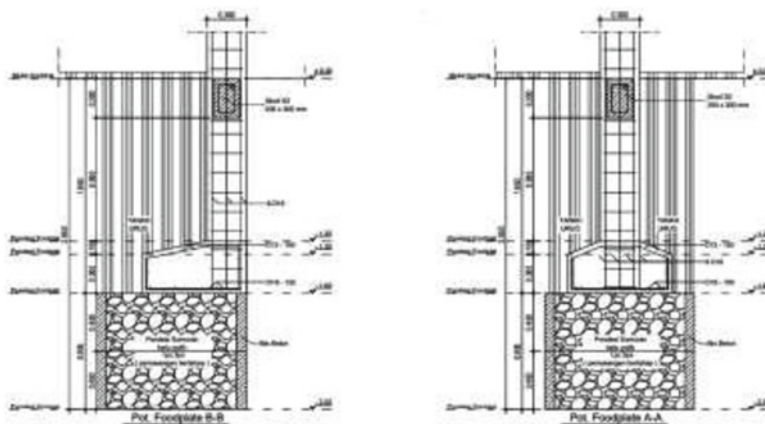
Footplat foundation redesign drawing (*Source* Widya Kartika 2021)
